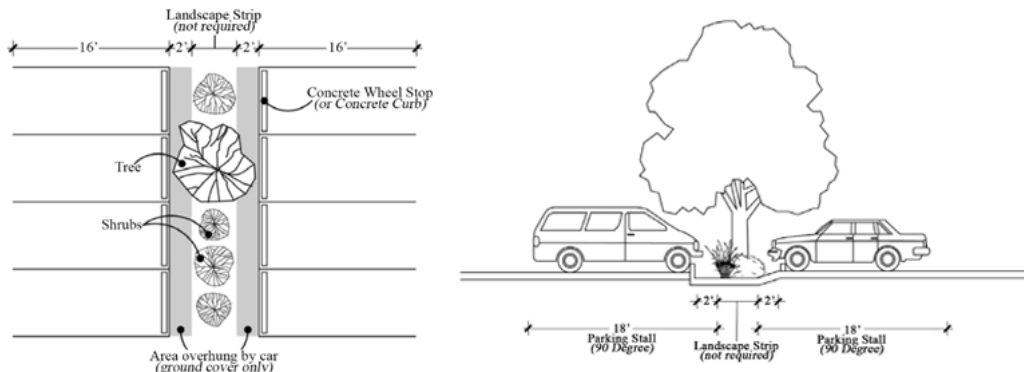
Off-Street Parking Landscaping Alternative
